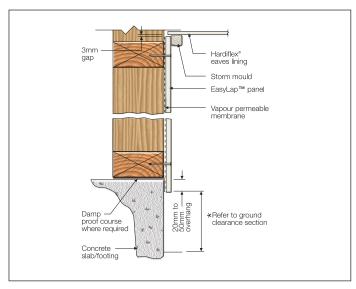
SLAB/EAVE JUNCTION DETAIL
